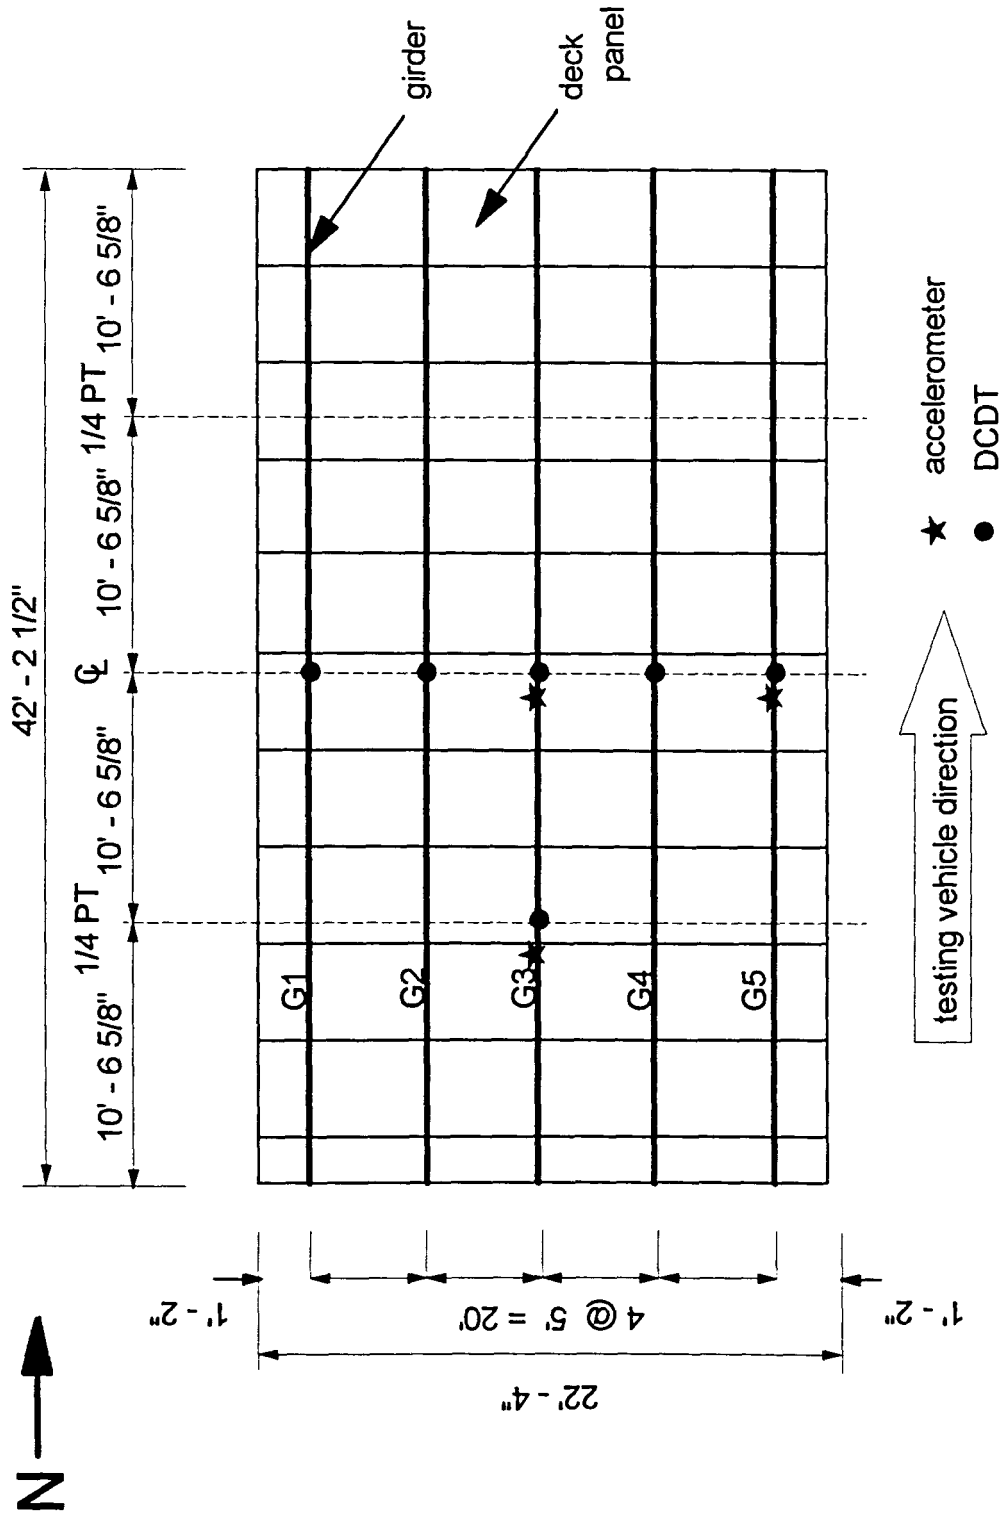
Mud Creek Bridge - layout and instrumentation
